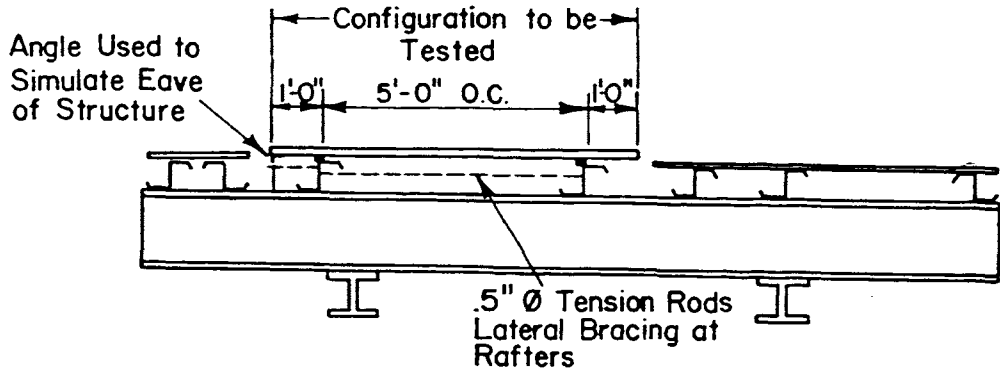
RAFTERS AND THIRD POINT BRACING LOCATIONS
